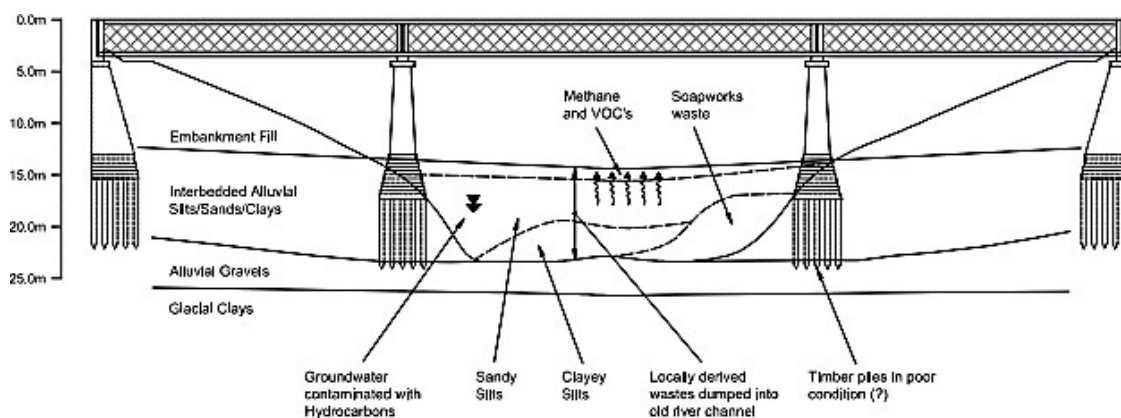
Schematic side view of the old bridge and underground conditions [16]
